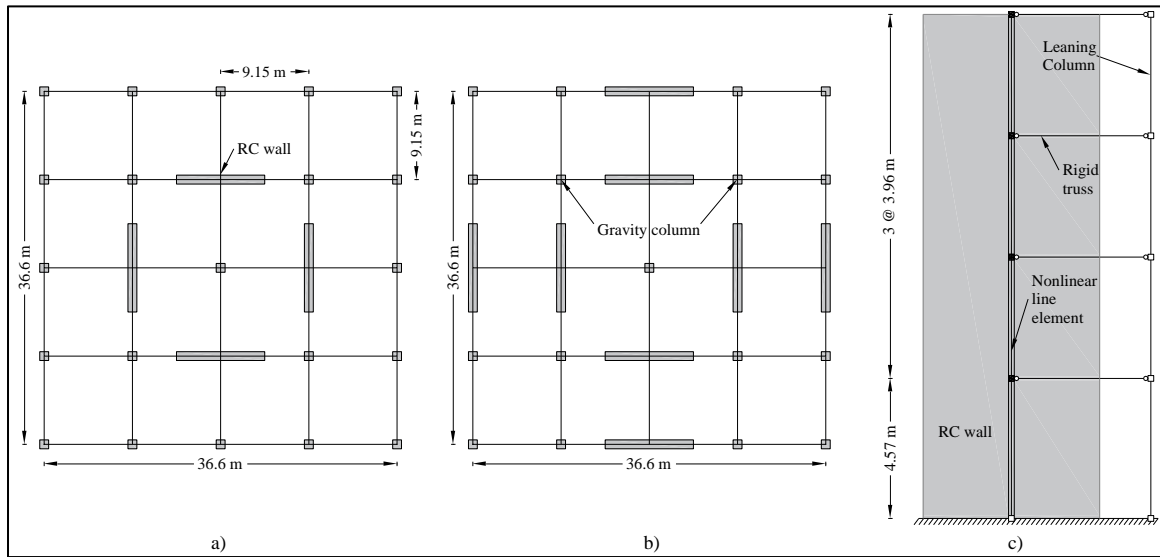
Archetype buildings. a) 4- and 8-story building floor plan; b) 12-story building floor plan; and c) elevation of the lower four stories of the buildings.
